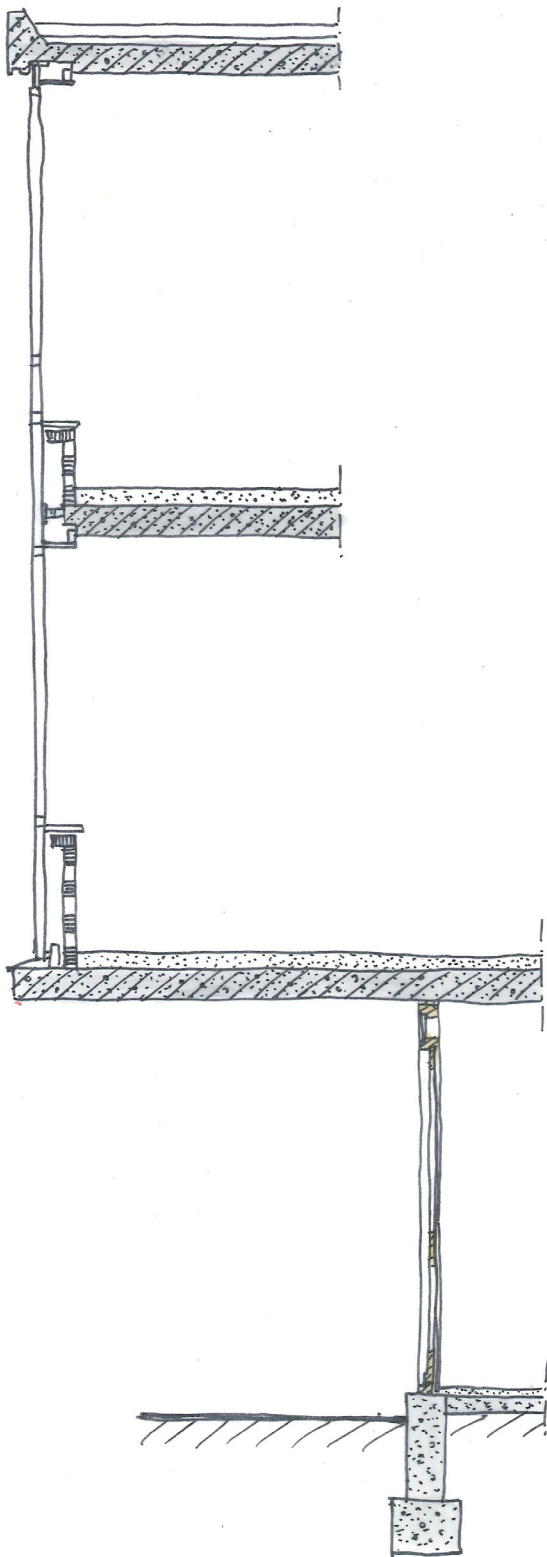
Section of the north façade of the terraced houses in Vrieheide (own ill.).
